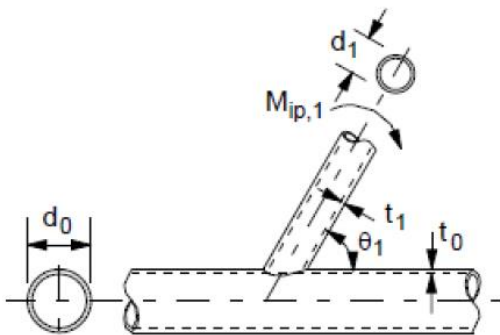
Design moment resistance of welded joints between circular hollow sections (Wardenier et al., 2010)
